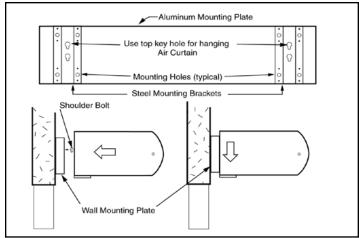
Installing Air Door on Wall Mounting Plate Proceed to Section V - Electrical Connections.
